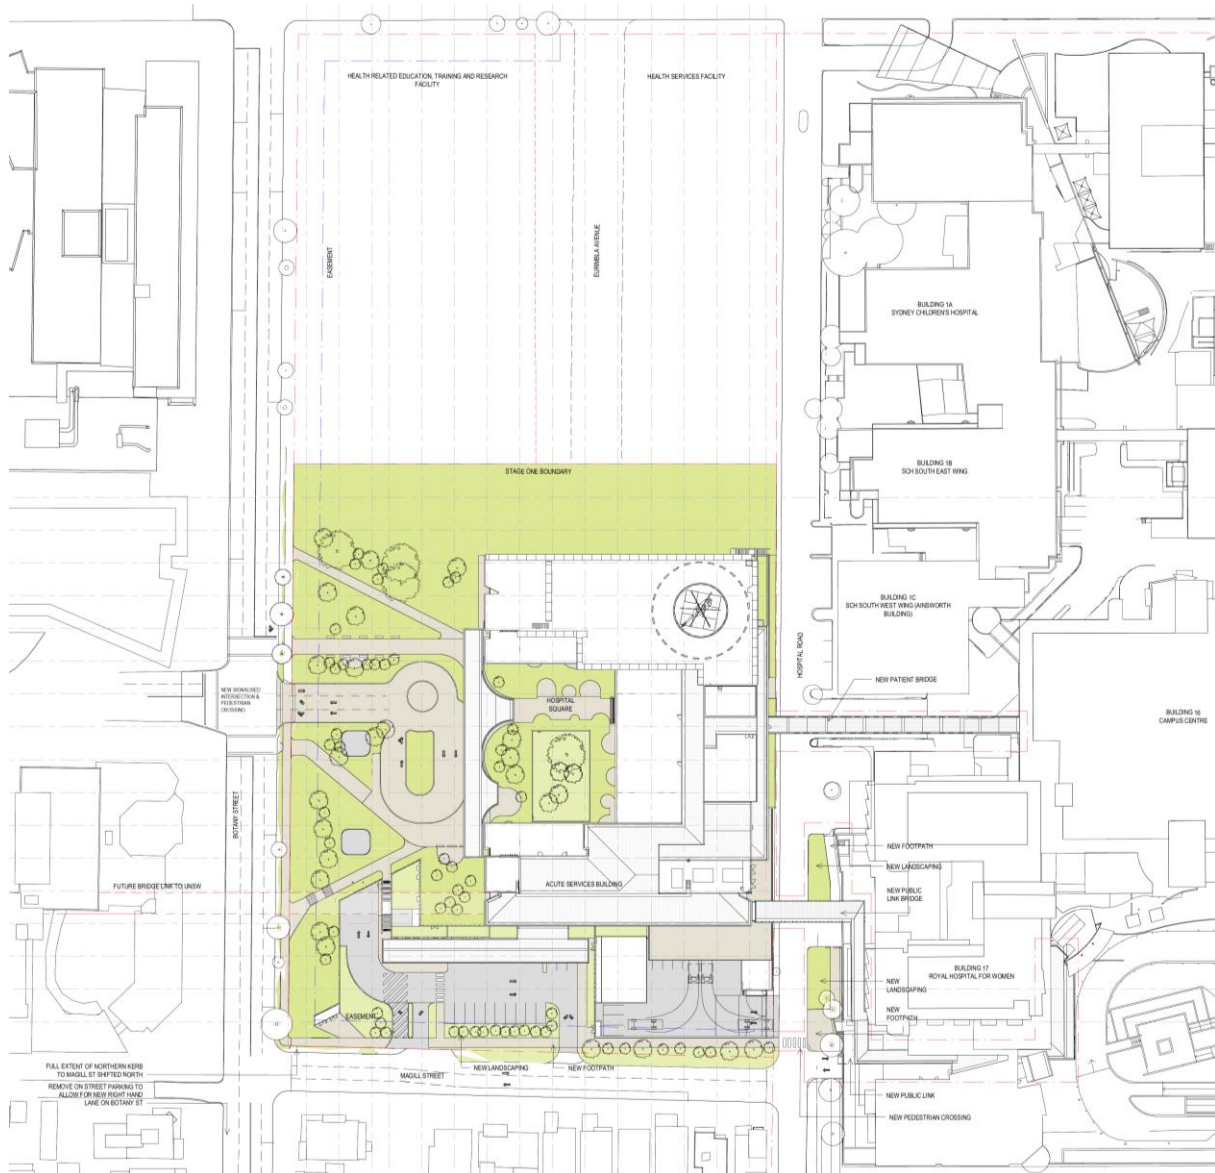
Proposed Site Plan (Source: BVN, 2018).
